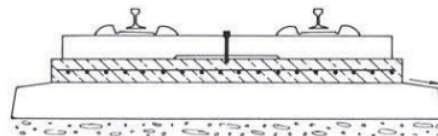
The sketch of sleeper panel mounted in a continuously reinforced concrete pavement (CRCP)
